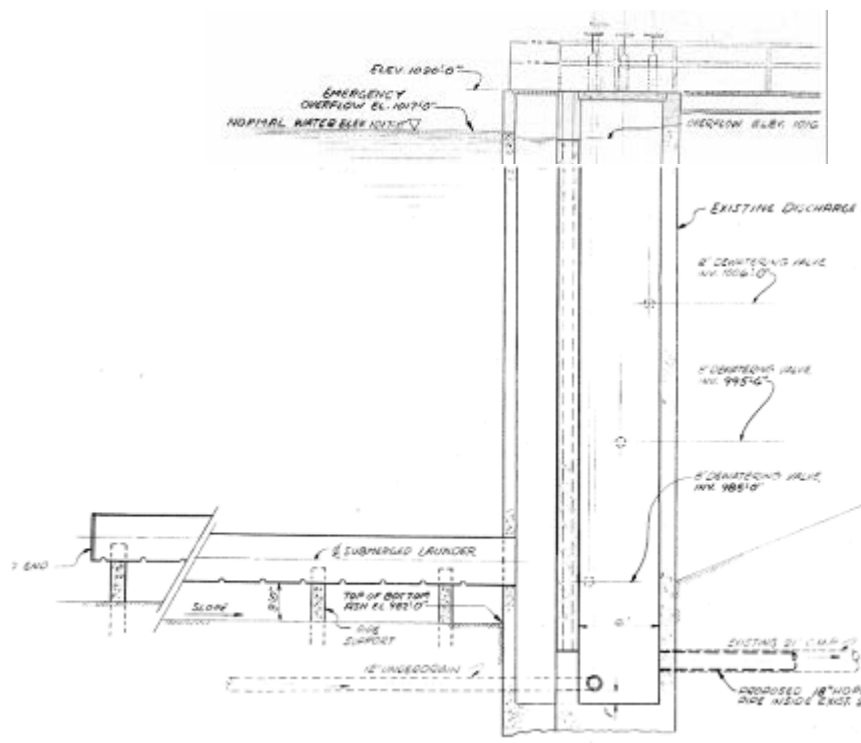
Section view of Thermal Pond outlet.
